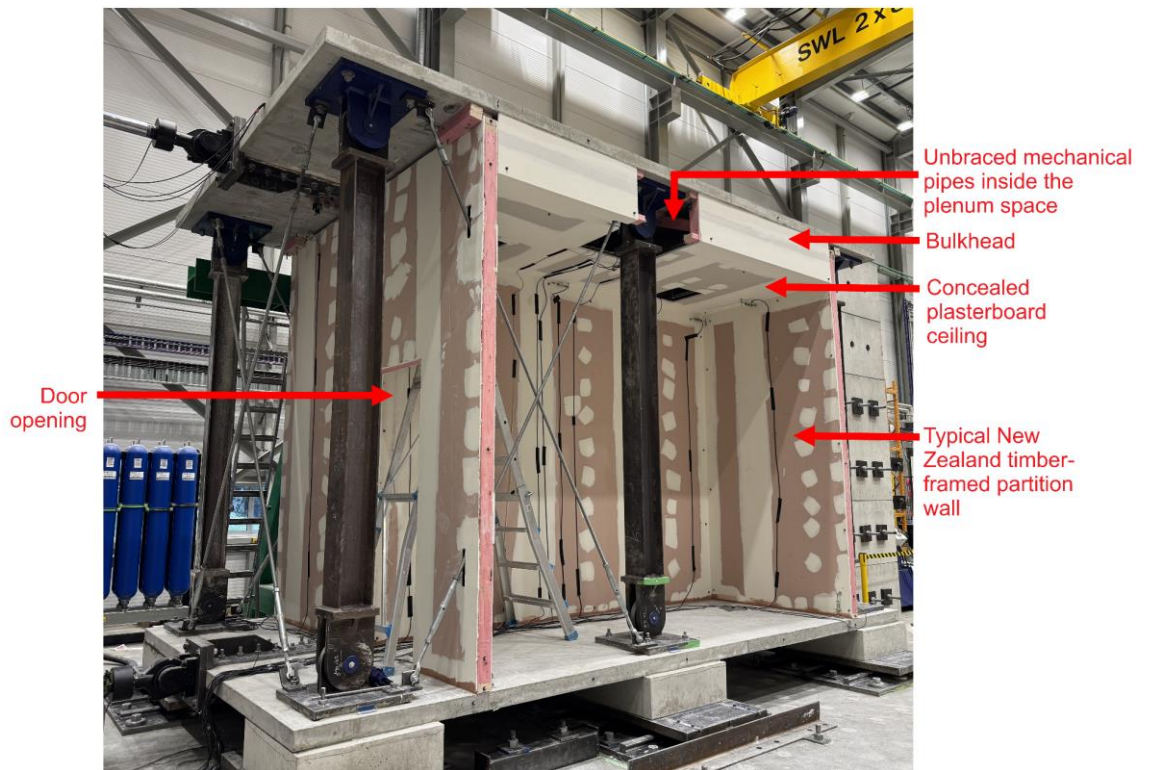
Photo of constructed specimen (Southeast elevation)
